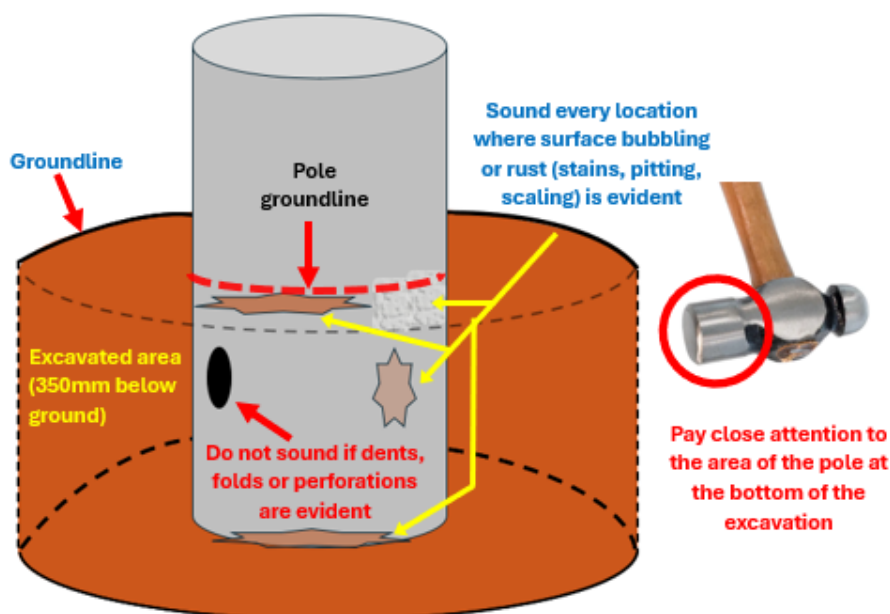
Sounding Steel Poles, Standards and Columns Below Groundline
